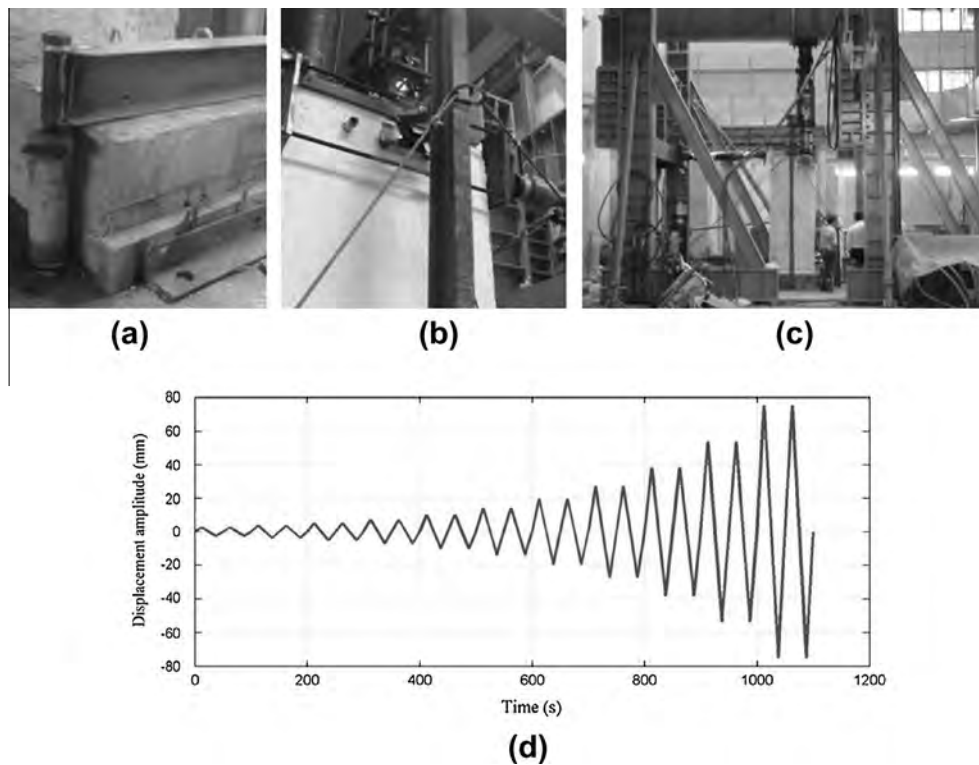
Test setup, (a) strong floor-foundation connection, (b) details of imposing vertical and lateral loads, (c) supporting frame of the actuator, and (d) loading history.
